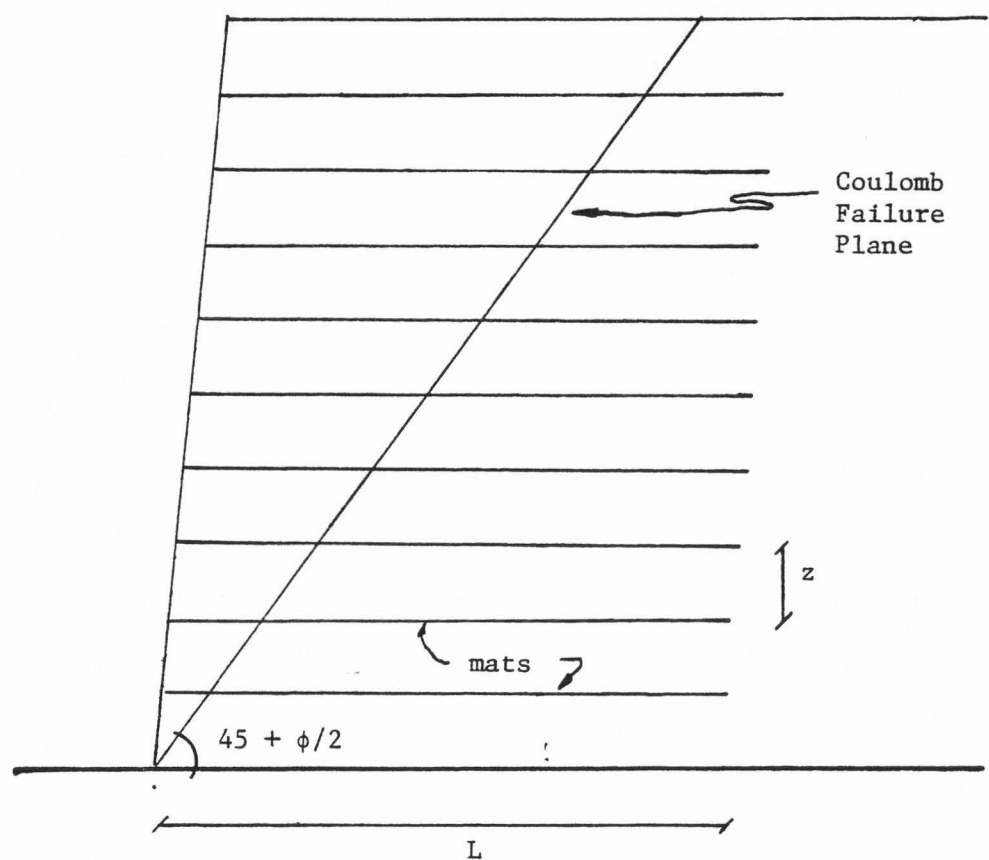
Generalized cross-section of welded wire wall showing the Coulomb failure plane.
